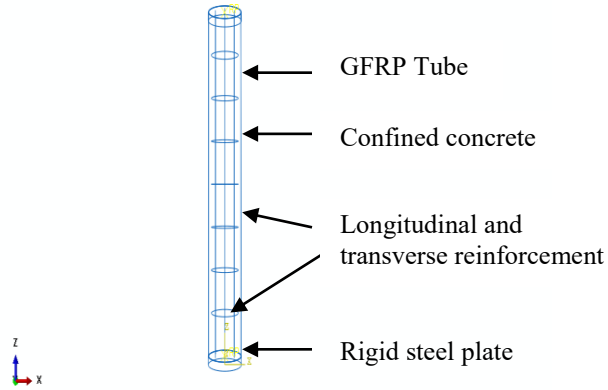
Typical sectional view of concrete in-filled FRP tubular column modeled using Finite Element Analysis software.
